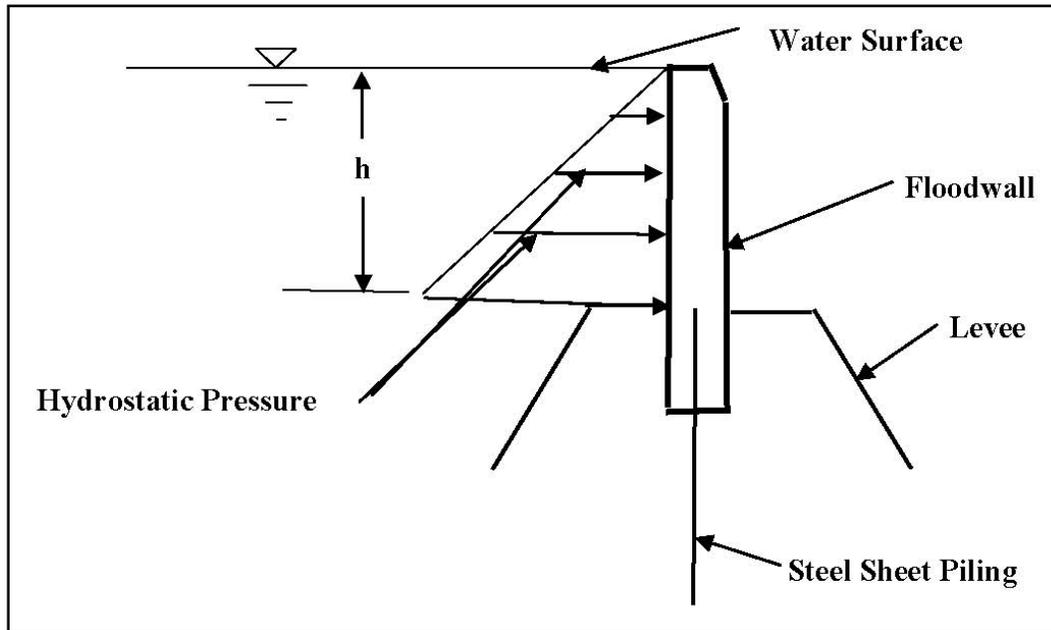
Definition sketch for east floodwall at imminent overtopping condition
